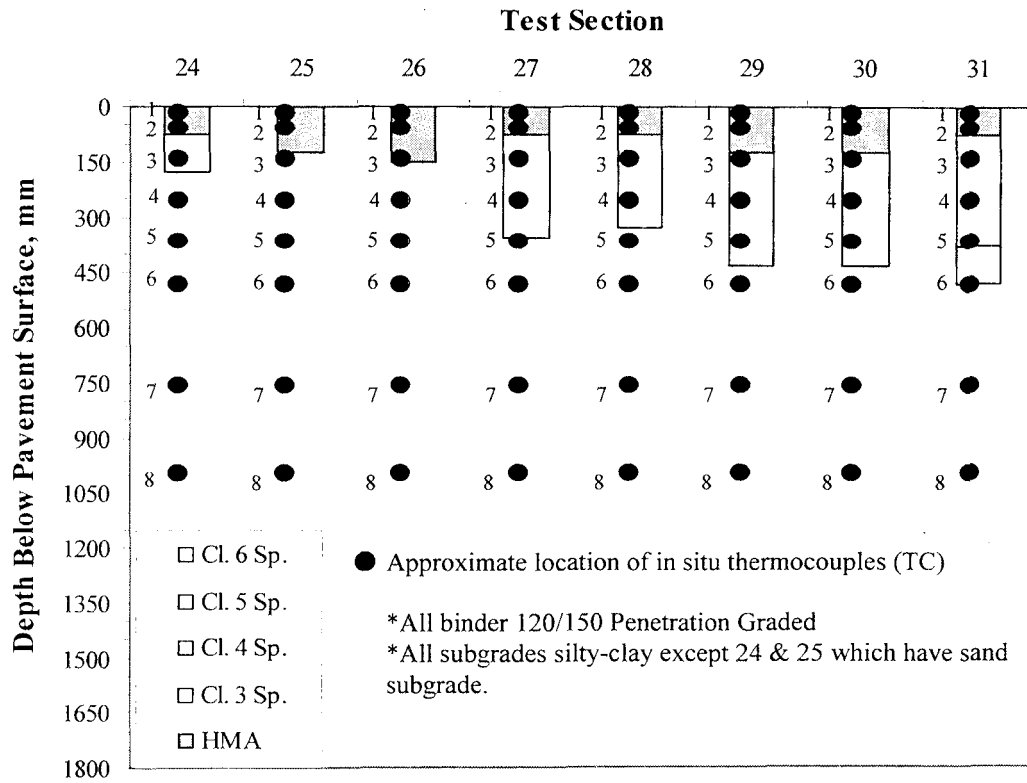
Mn/ROAD test sections with locations of in situ thermocouple sensors.
